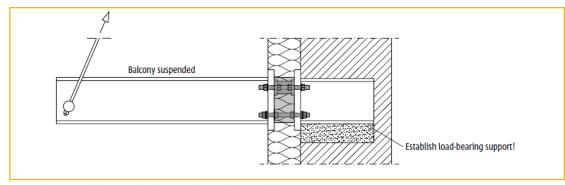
Balcony suspended, connected with KSTZ and KSTQ modules (steel balcony)
